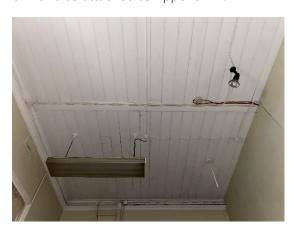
Timber tongue and groove floor ceilings (Room G2)
